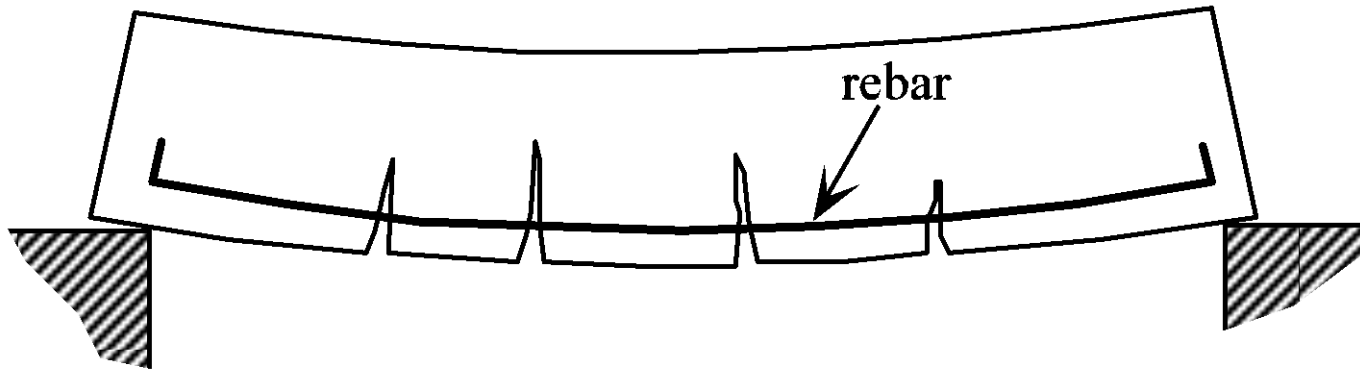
Cracks in a reinforced concrete beam.
